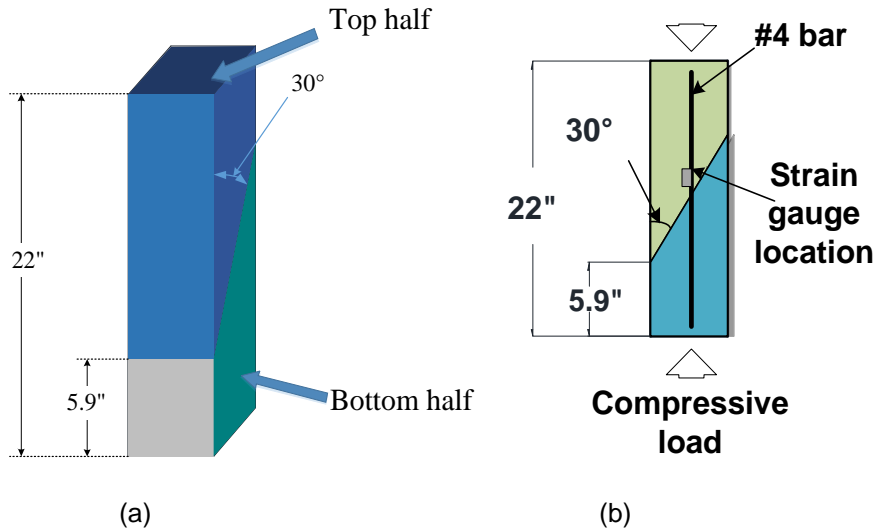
2 (a) Slant shear test specimen and (b) slant shear specimen showing rebar and strain gauge location.
